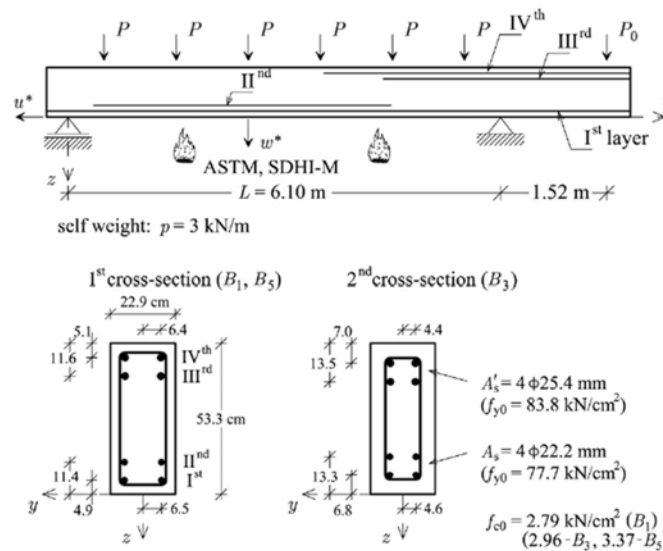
A simply supported concrete beam with overhangs (Lin et al., 1988)
